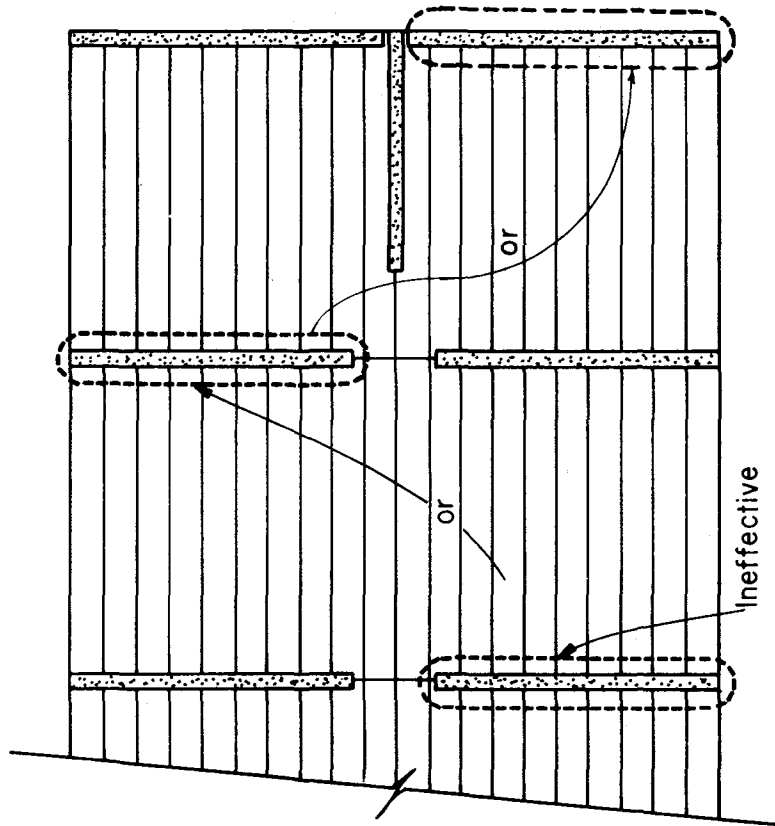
Extent of Assumed Maximum Wall Damage under Abnormal Loads
